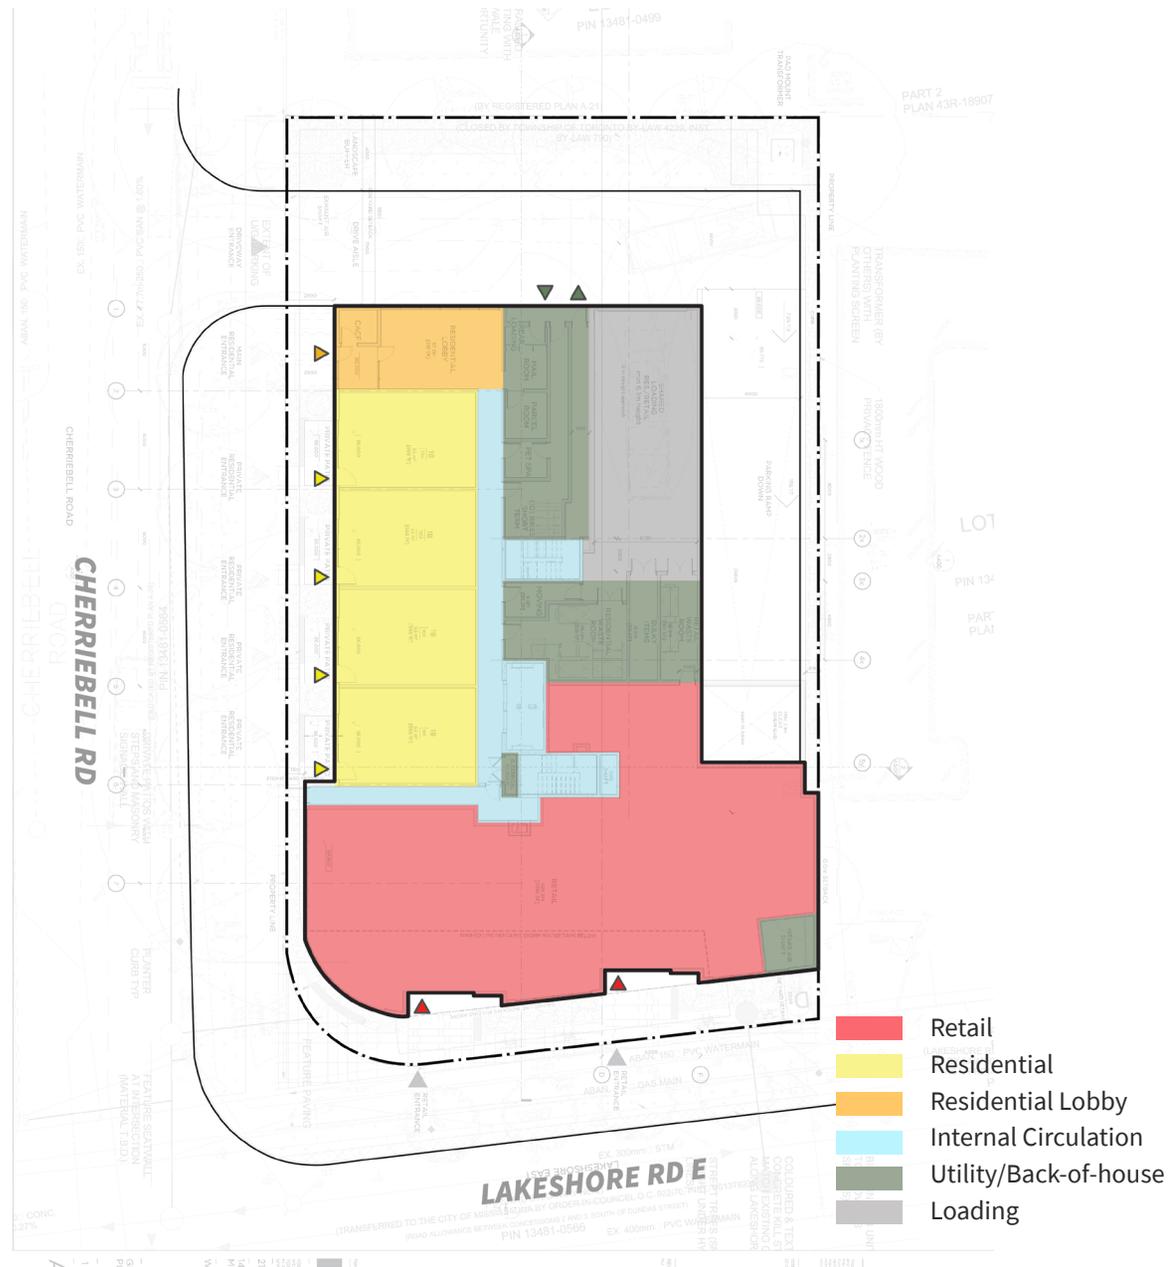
Annotated ground floor plan showing the proposed mix of uses
